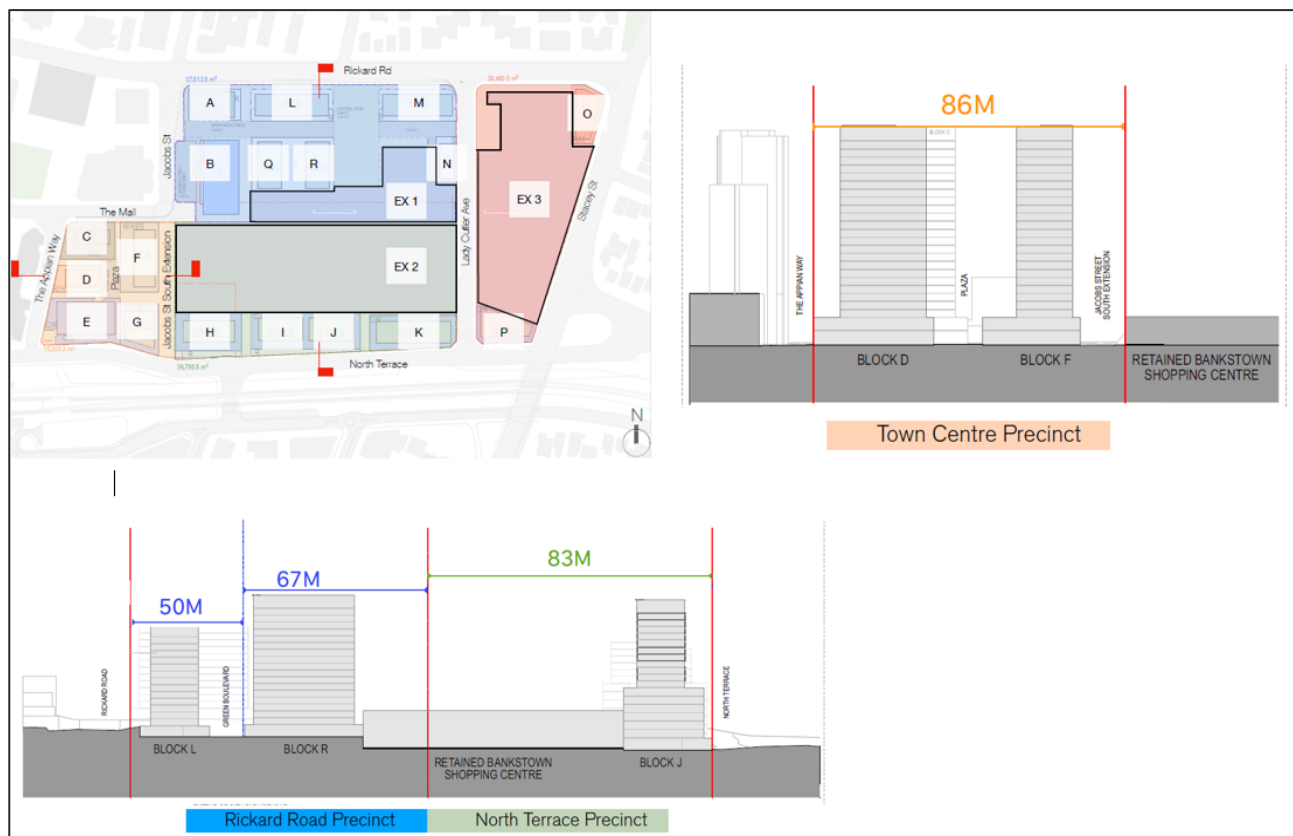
Proposed building height sections (Source: Planning Proposal, 2022)
